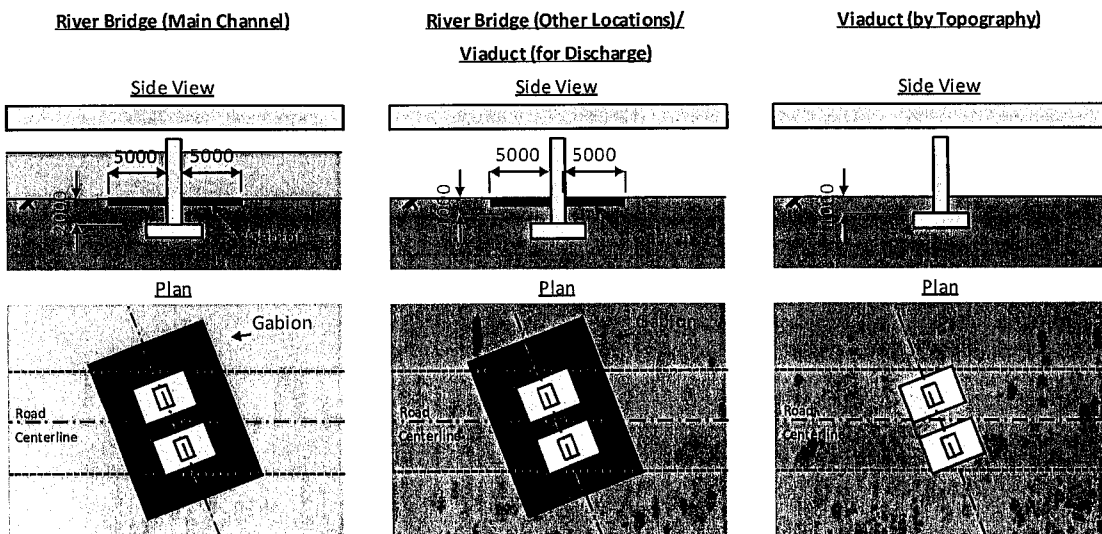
Requirements for Embedding and River Bed Protection of Pier
